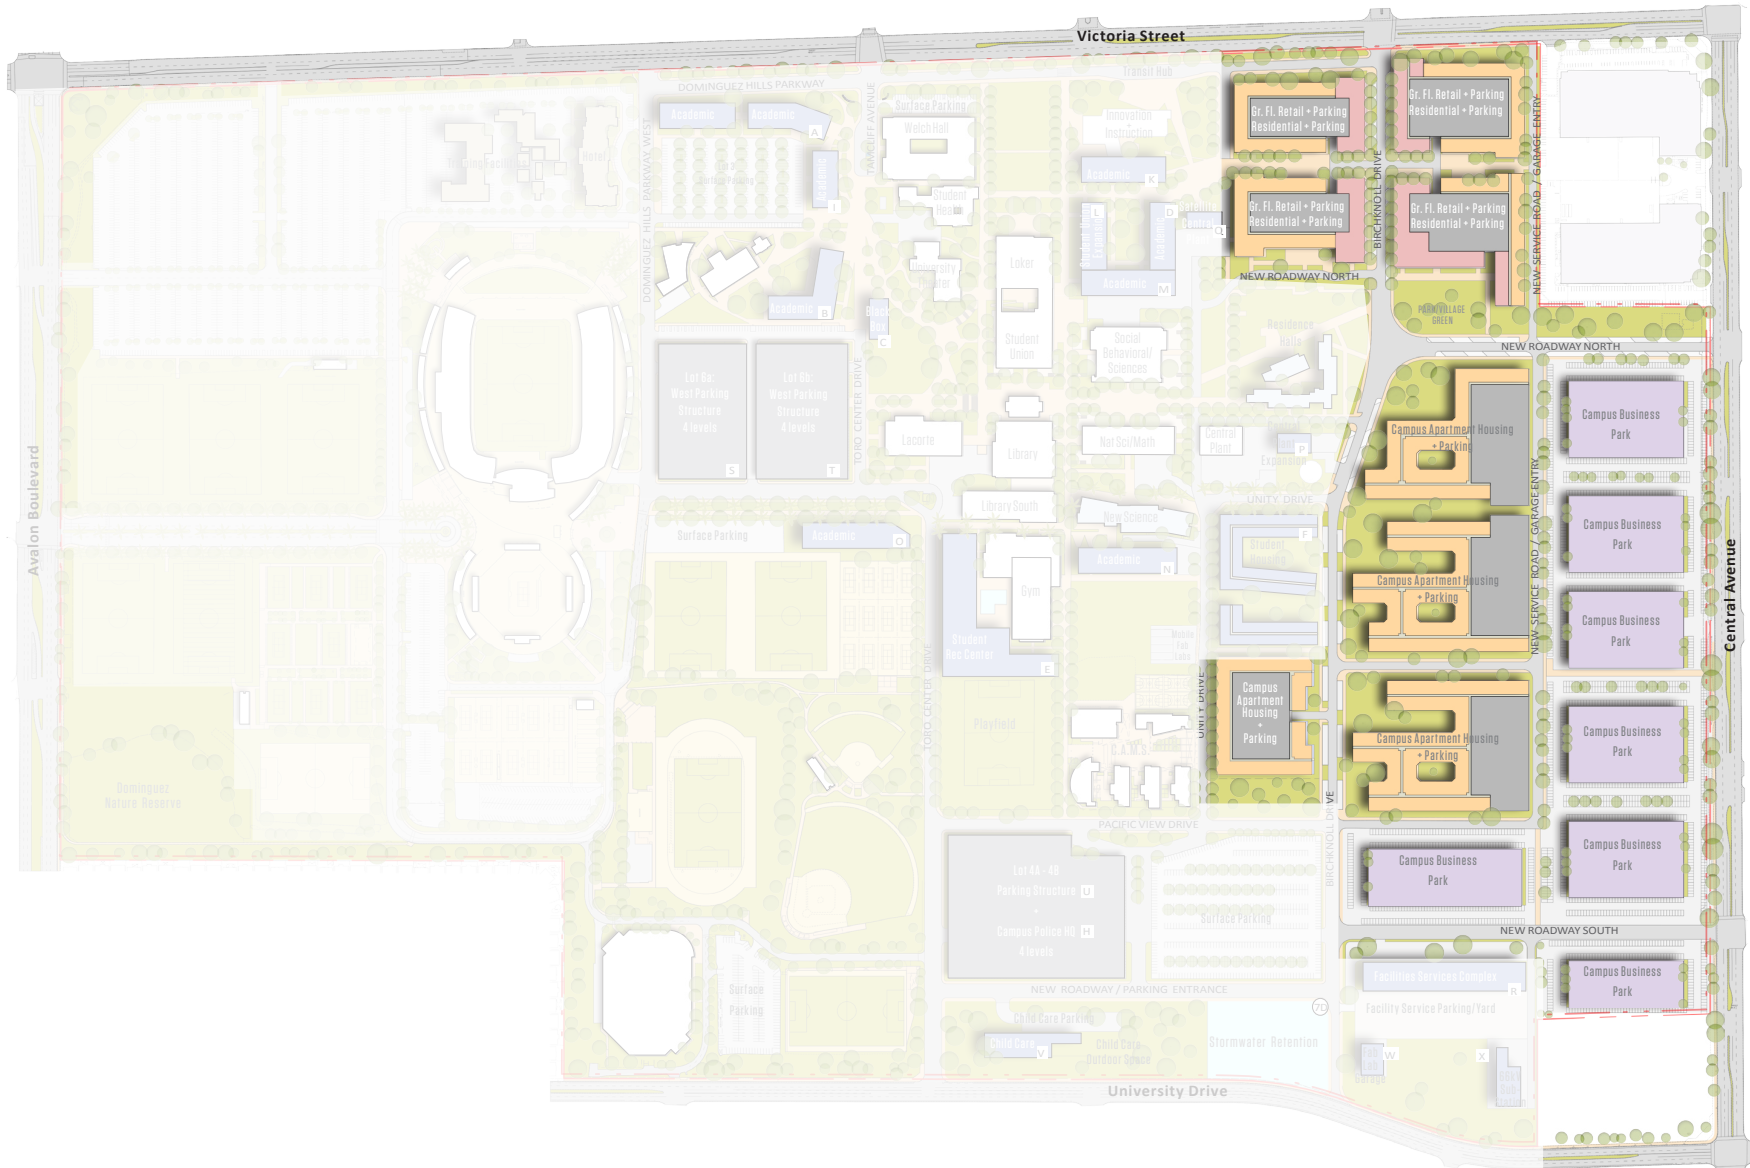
UNIVERSITY VILLAGE BUILDINGS
